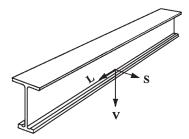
Loads acting on monorail runway beam (proprietary track shown).
